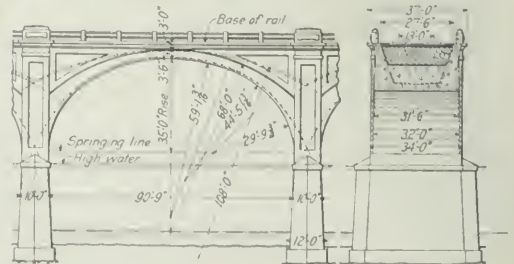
Elevation and Section of 90 ft. 9 in. Arch of Bridge.
